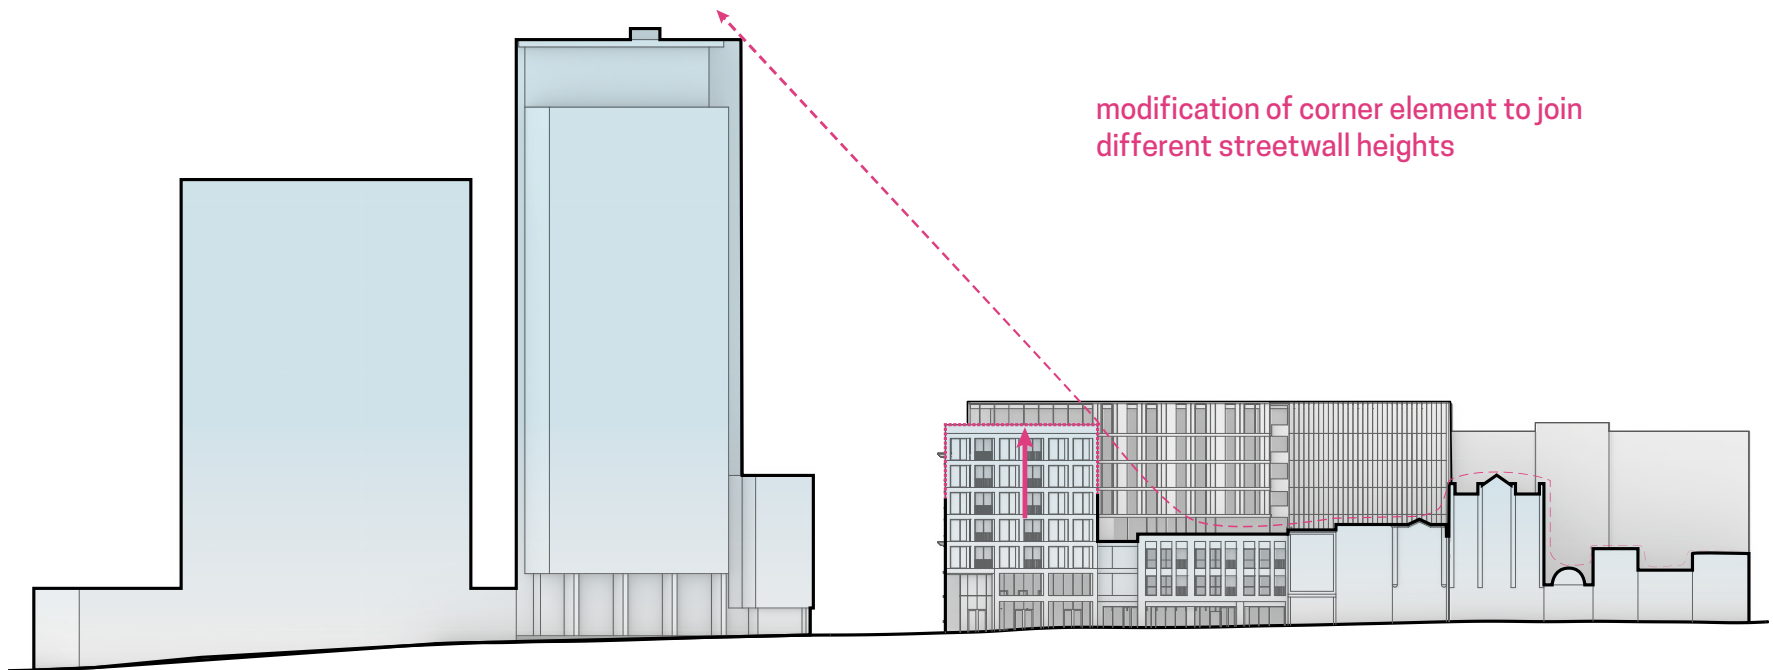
d Streetwall Height: Barrington Street elevation showing heights of adjacent streetwalls.
